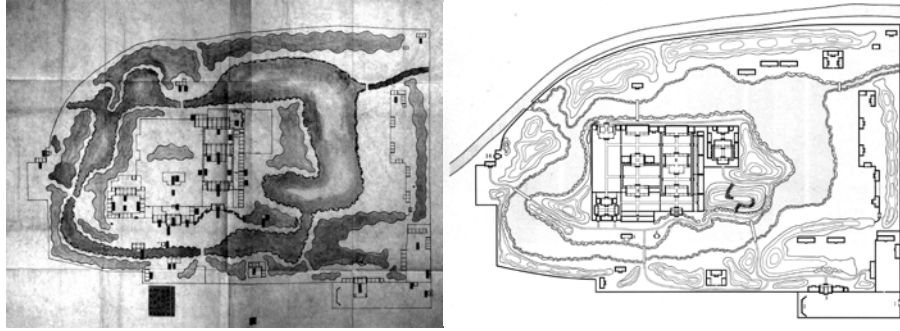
8 The Plans of Langrun Garden Before and After Rebuild
